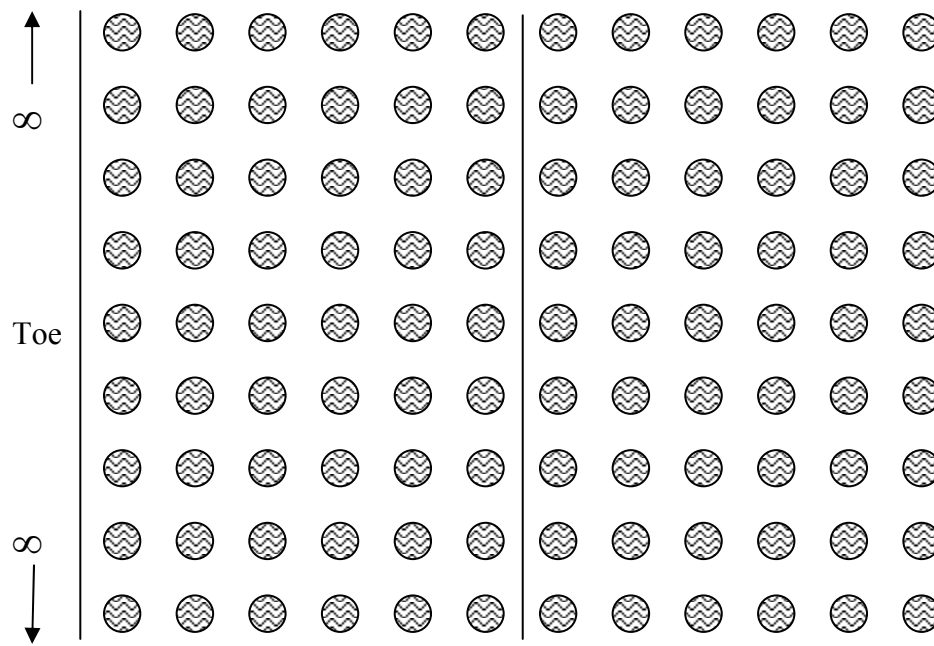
Plan of example deep-mixed, column-supported embankment
